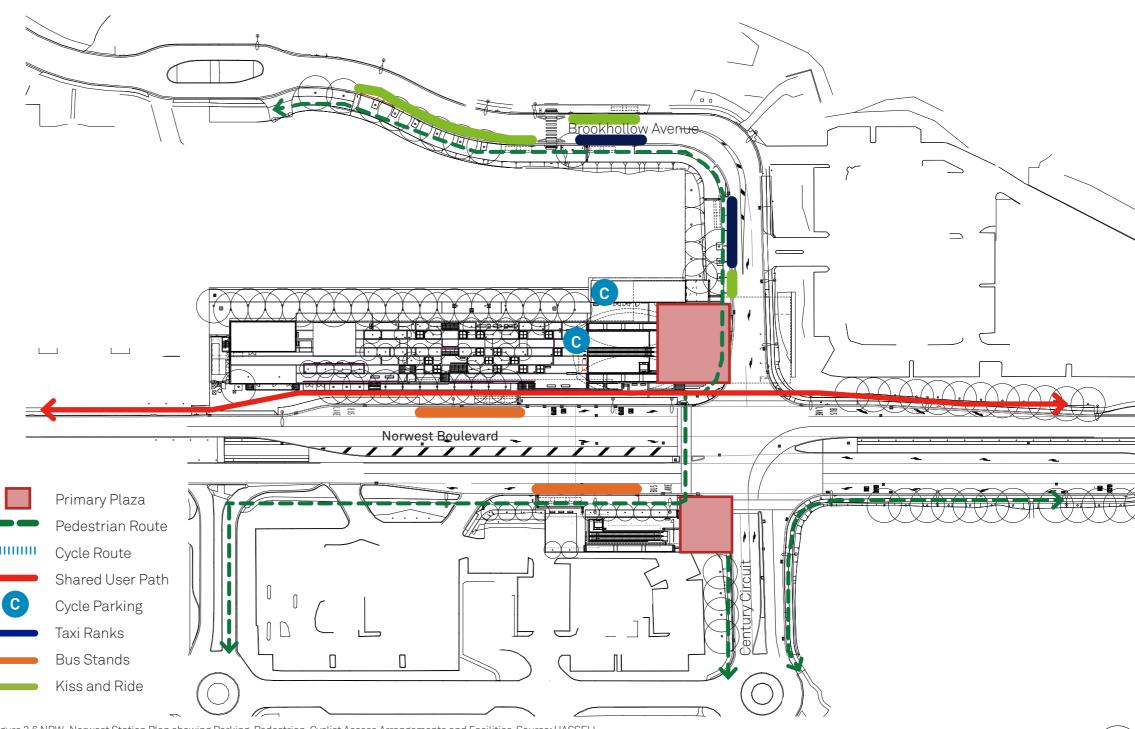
NRW_Norwest Station Plan showing Parking, Pedestrian, Cyclist Access Arrangements and Facilities. Source: HASSELL.
